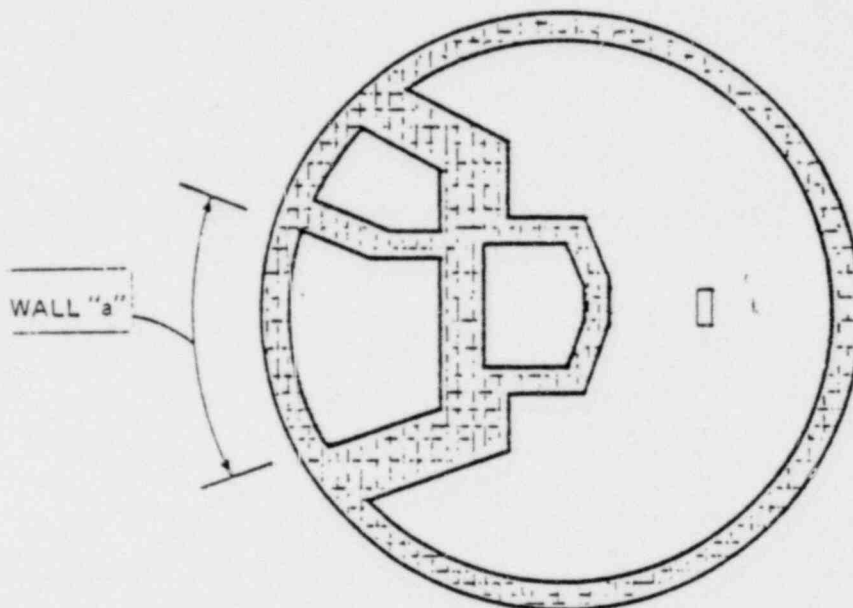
PLAN VIEW, BETWEEN BASEMENT AND FIRST FLOOR LEVELS, CASE 1A
